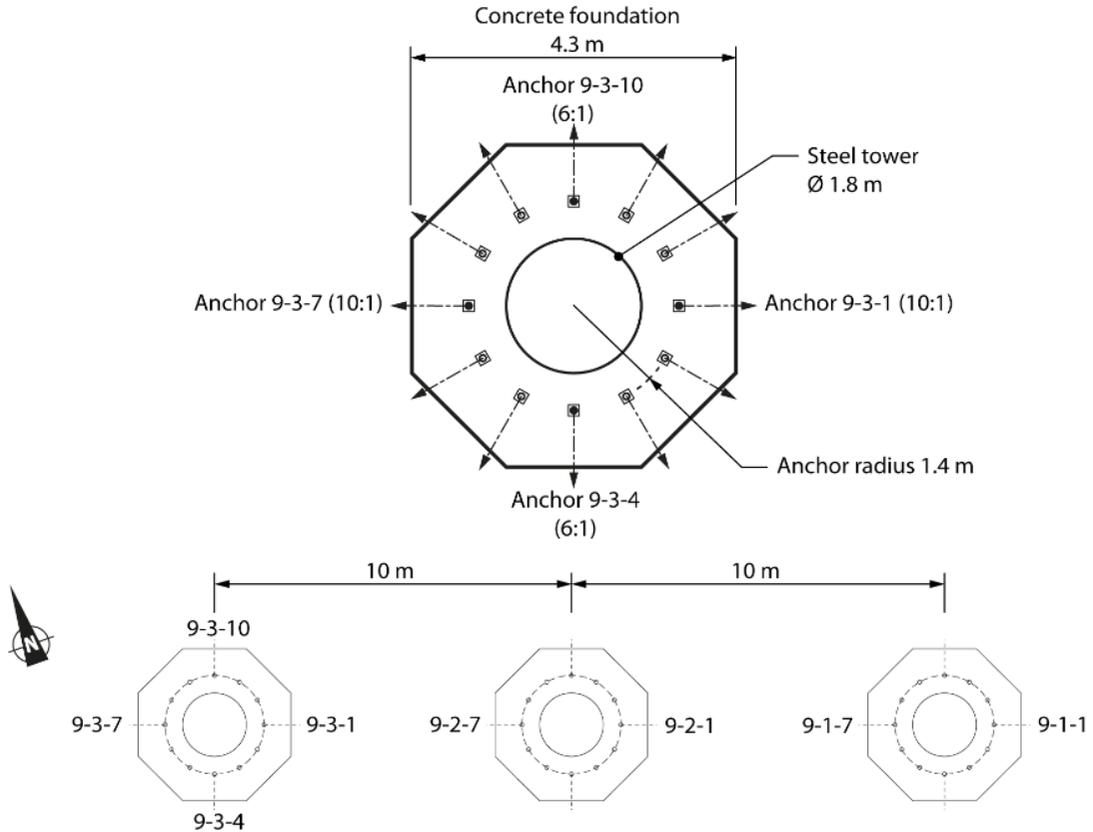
Plan view of octagonal shaped concrete tower foundations with rock anchors ($\varnothing 40$ mm) at tower No. 9. The anchors are installed with an outward inclination, and plunging alternately 10:1 and 6:1.
